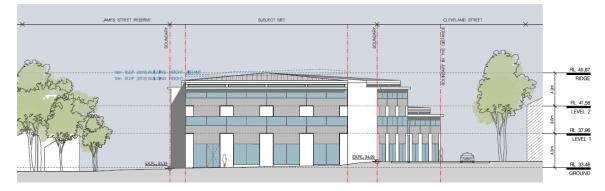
Pre-DA Scheme 1 - Marriott Street Elevation
